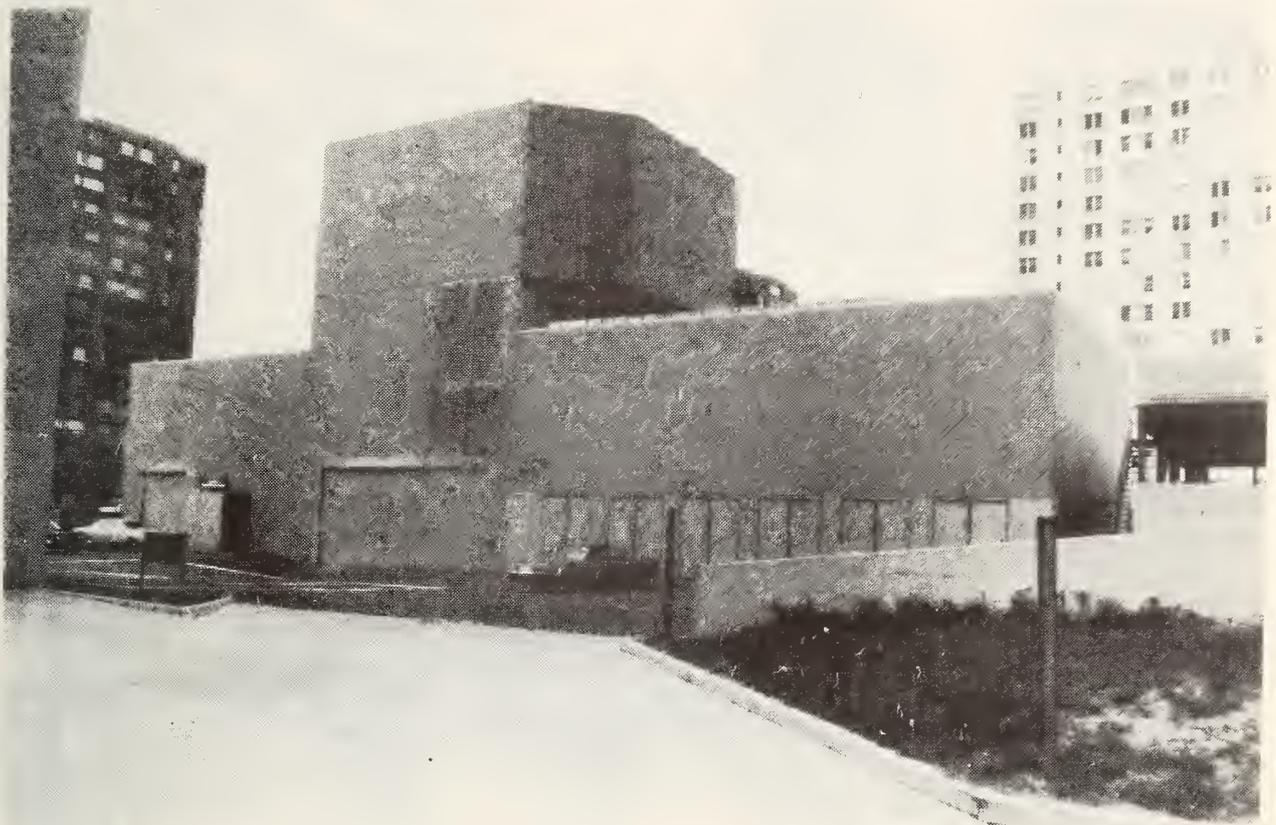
Central Equipment Building which houses the Total Energy Plant. The five engine-generators are located just inside the six sets of doors. The central tower houses the cooling towers. Ventilation air for the plant is supplied through the central grill.
